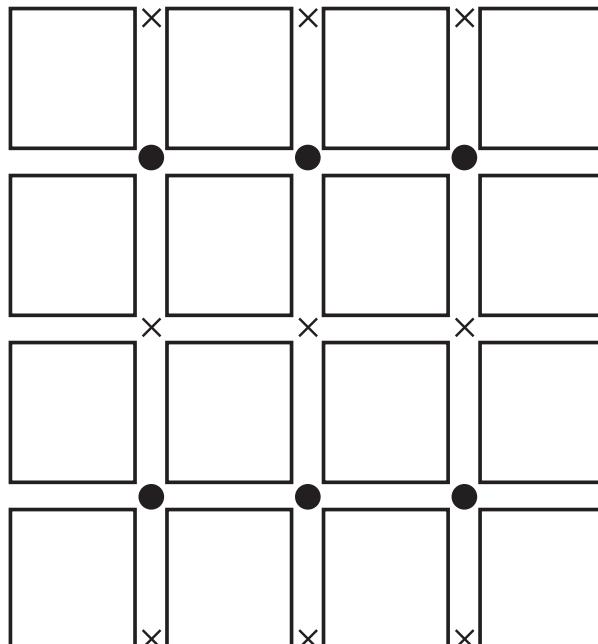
Multiple-row rack sprinkler layout: small metal containers (elevation view)
